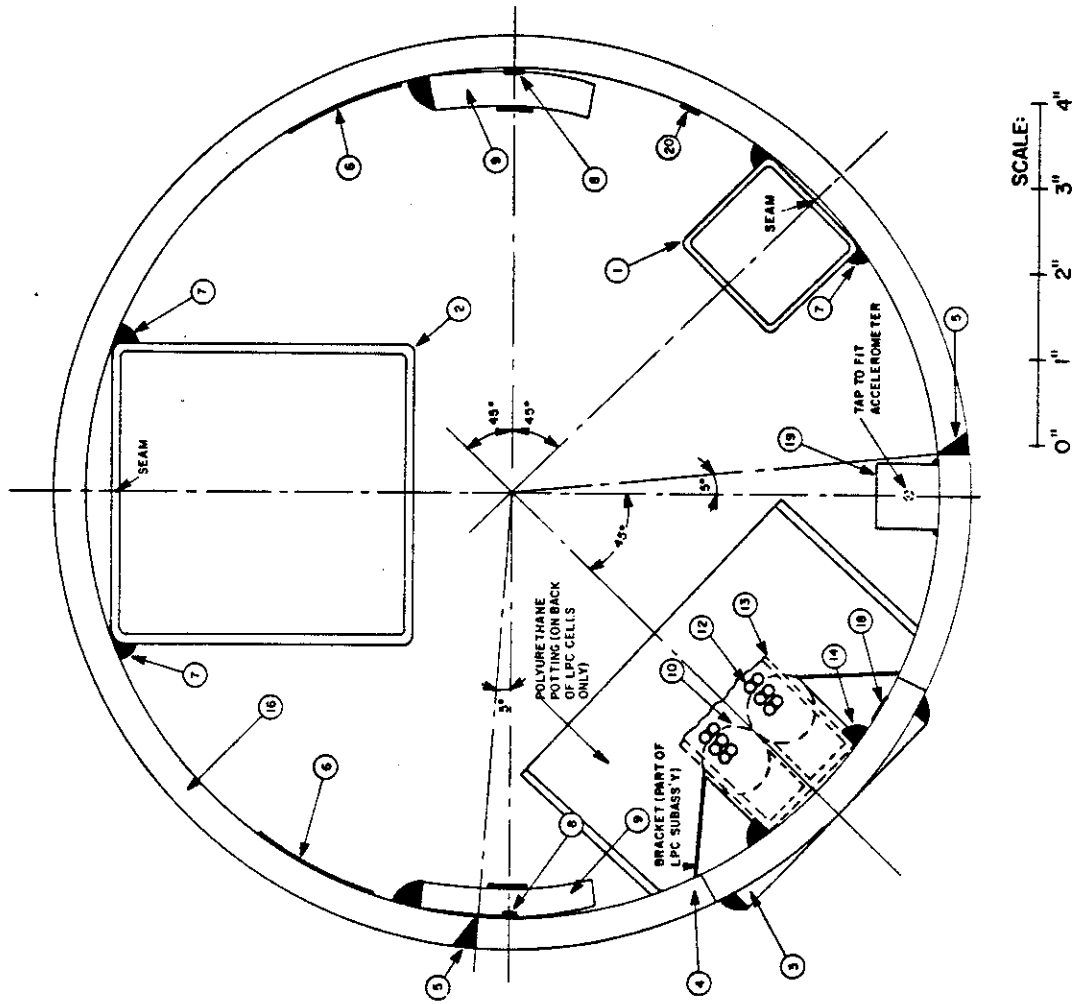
CROSS-SECTIONAL VIEW OF TYPICAL FIVE-FOOT (1.5-M) PILE SEGMENT (1 in = 25.4 mm)
